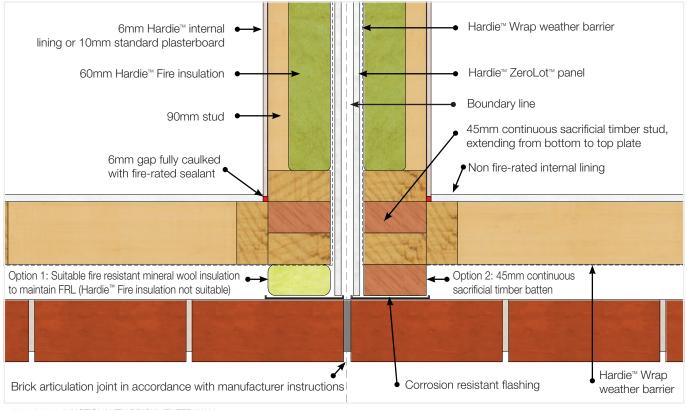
JUNCTION WITH BRICK VENEER WALL
